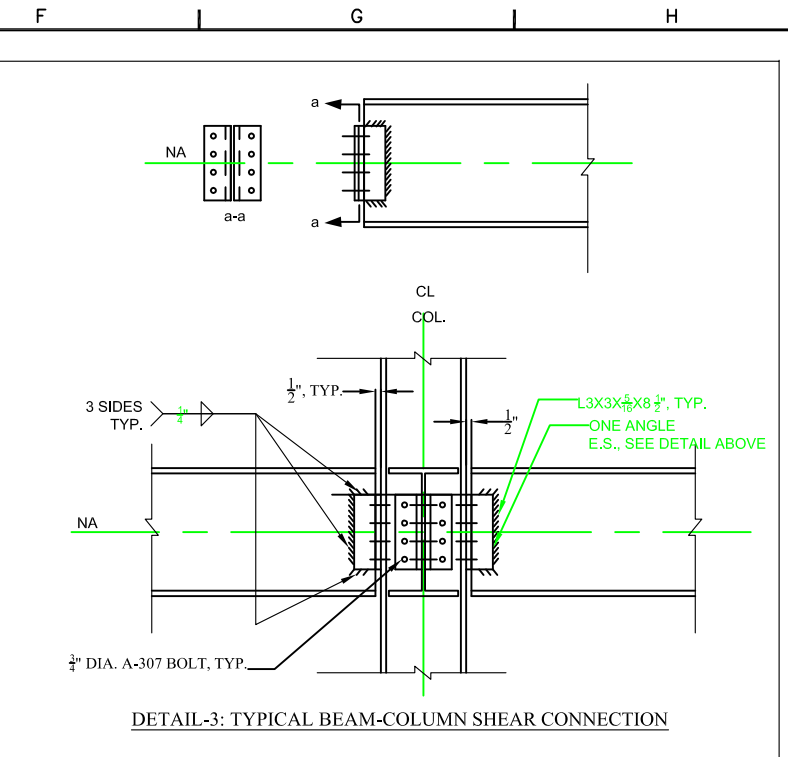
TYPICAL BEAM-COLUMN SHEAR CONNECTION
